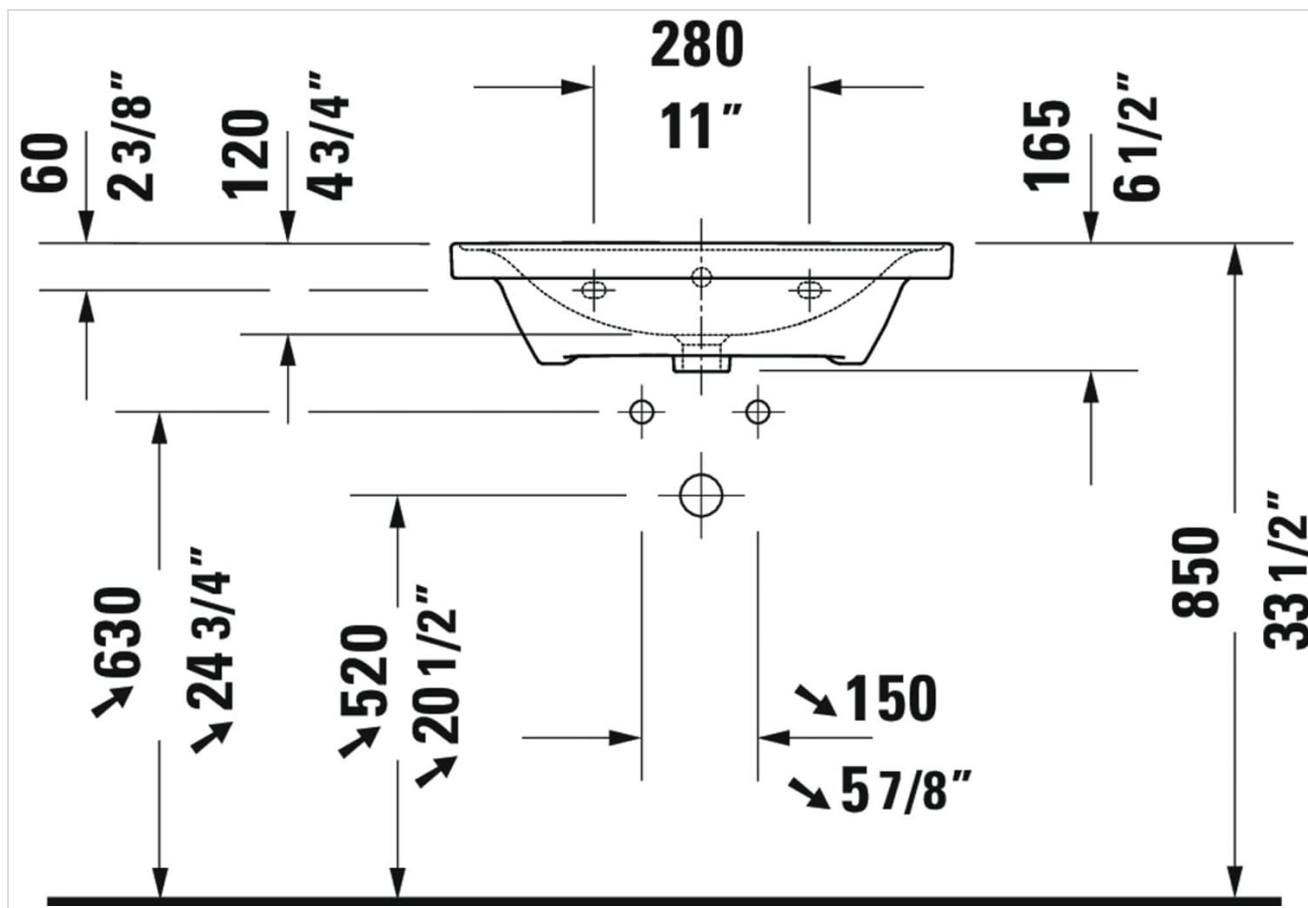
Alternative Side View Technical Drawing. This diagram provides additional side profile dimensions and plumbing connection heights, which may vary based on specific installation requirements. All measurements are in millimeters and inches.
